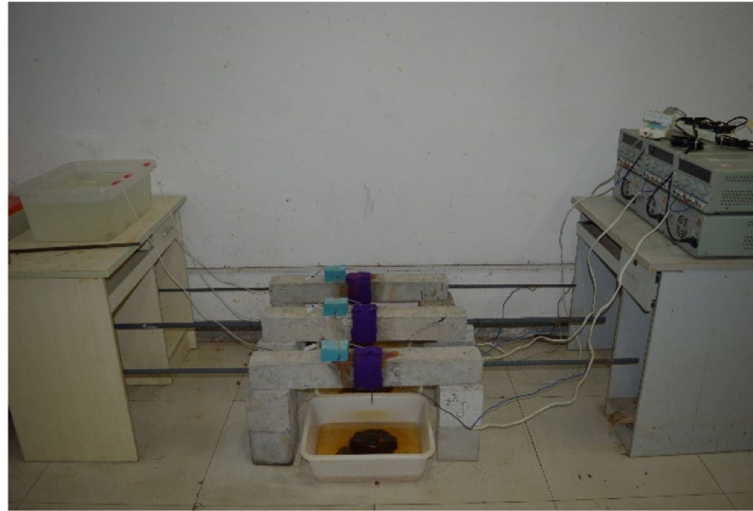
Corrosion process diagram of reinforced concrete structure specimen
